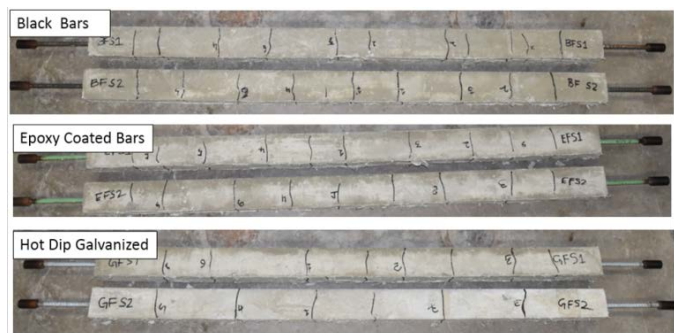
Typical Cracks on Prism Specimens with Fibers
